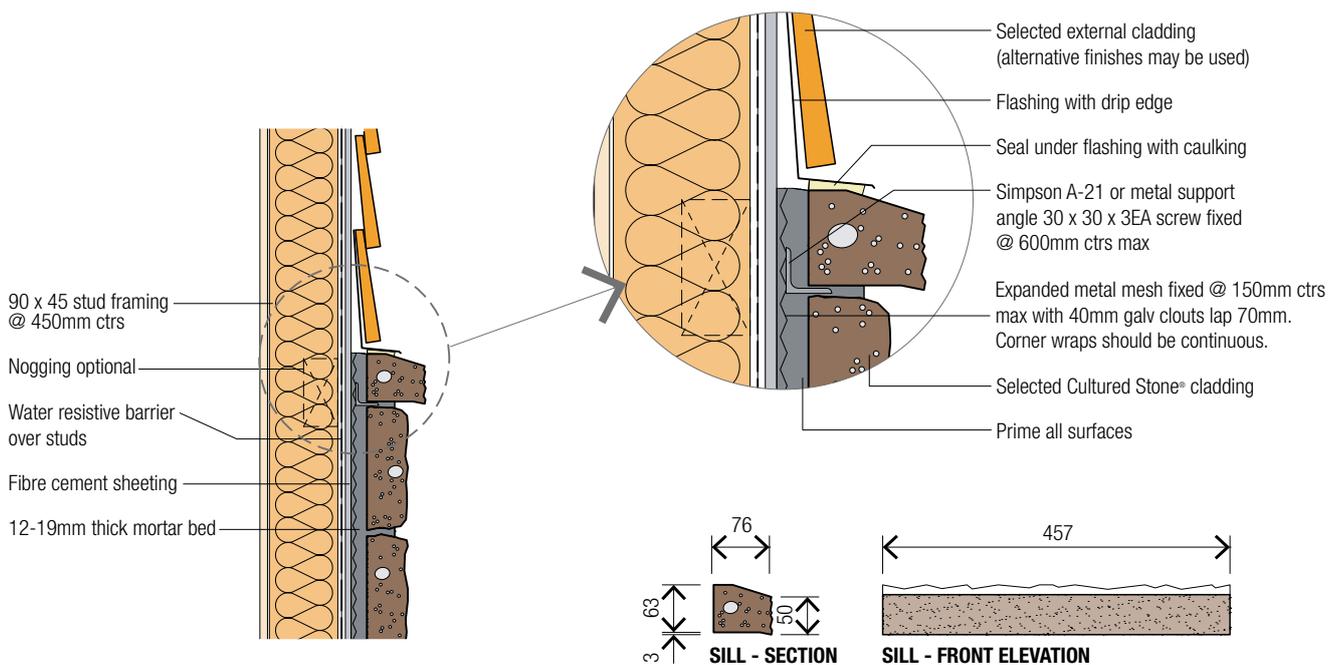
Watertable Sill Cladding Transition - Section (Dwg # CS-06.03)
